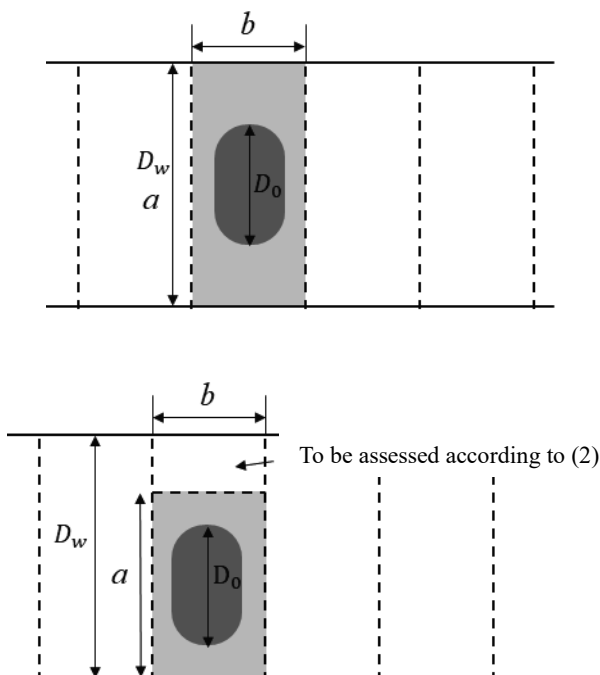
Parameter Settings for a Girder Web with an Opening (Unreinforced Opening)
